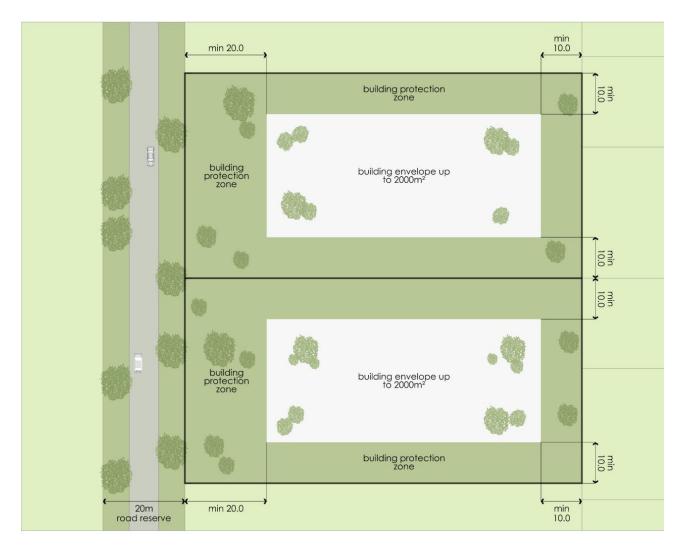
Indicative Building Envelopes and Cross-Section – Typical Lots
